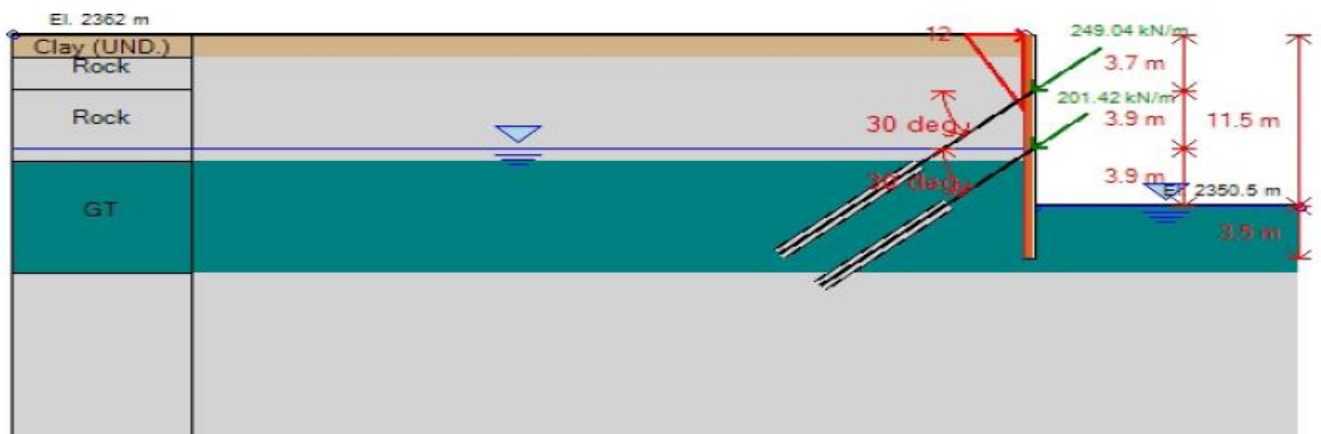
final excavations for 3.7m and 1.5m pile spacing
